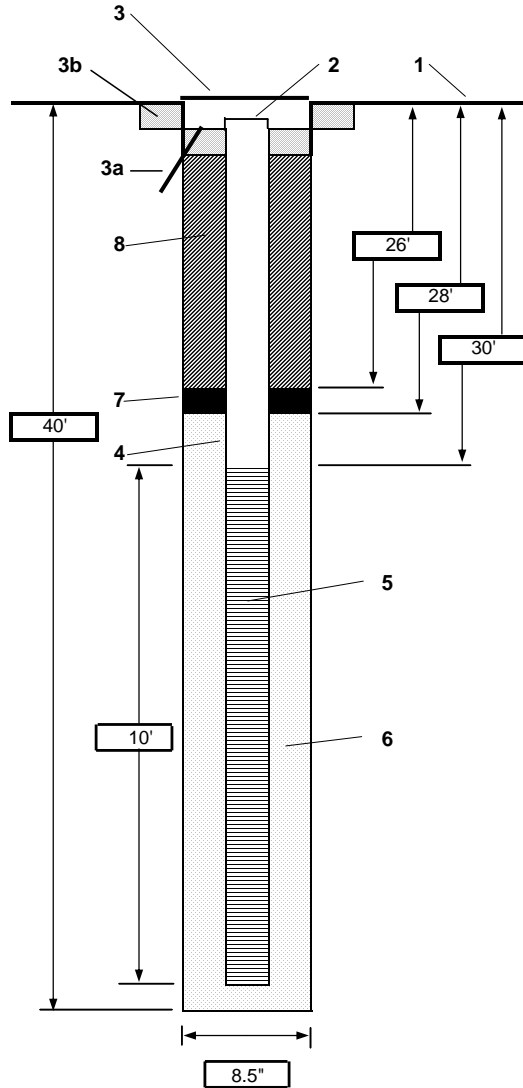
Typical Shallow Injection Well Construction, Study Area 17, NTC Orlando
